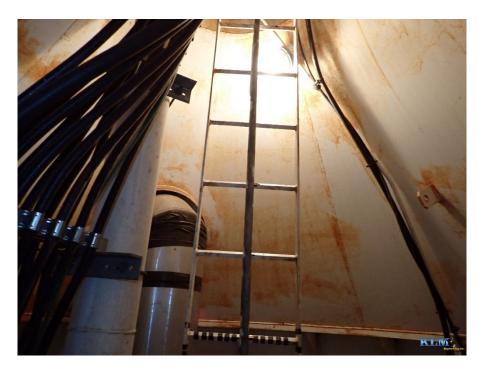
Bowl conditions with fill pipe and overflow pipe visible
